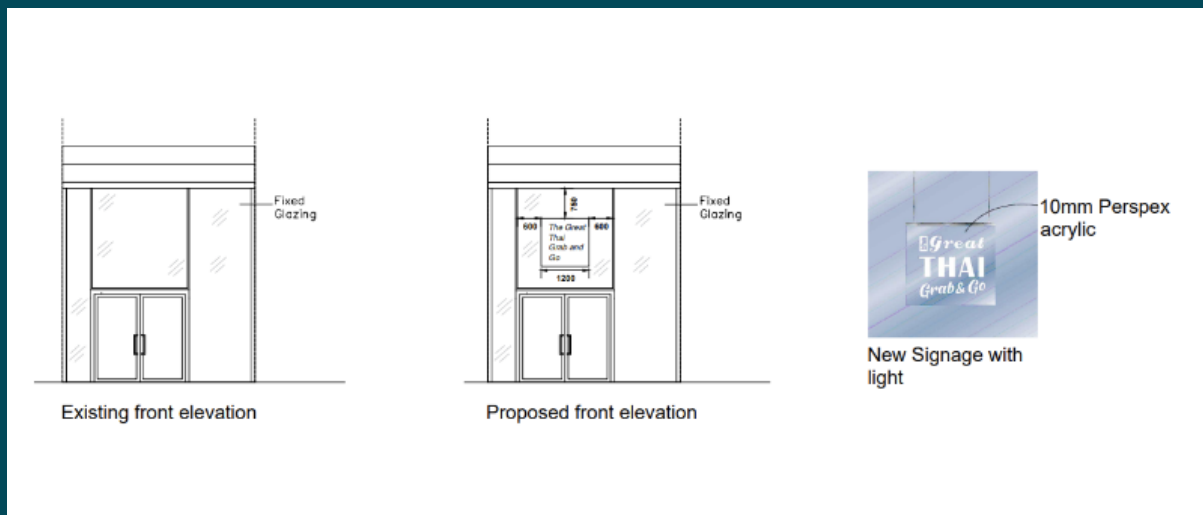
Existing and proposed elevation – not to scale please see submitted drawings
